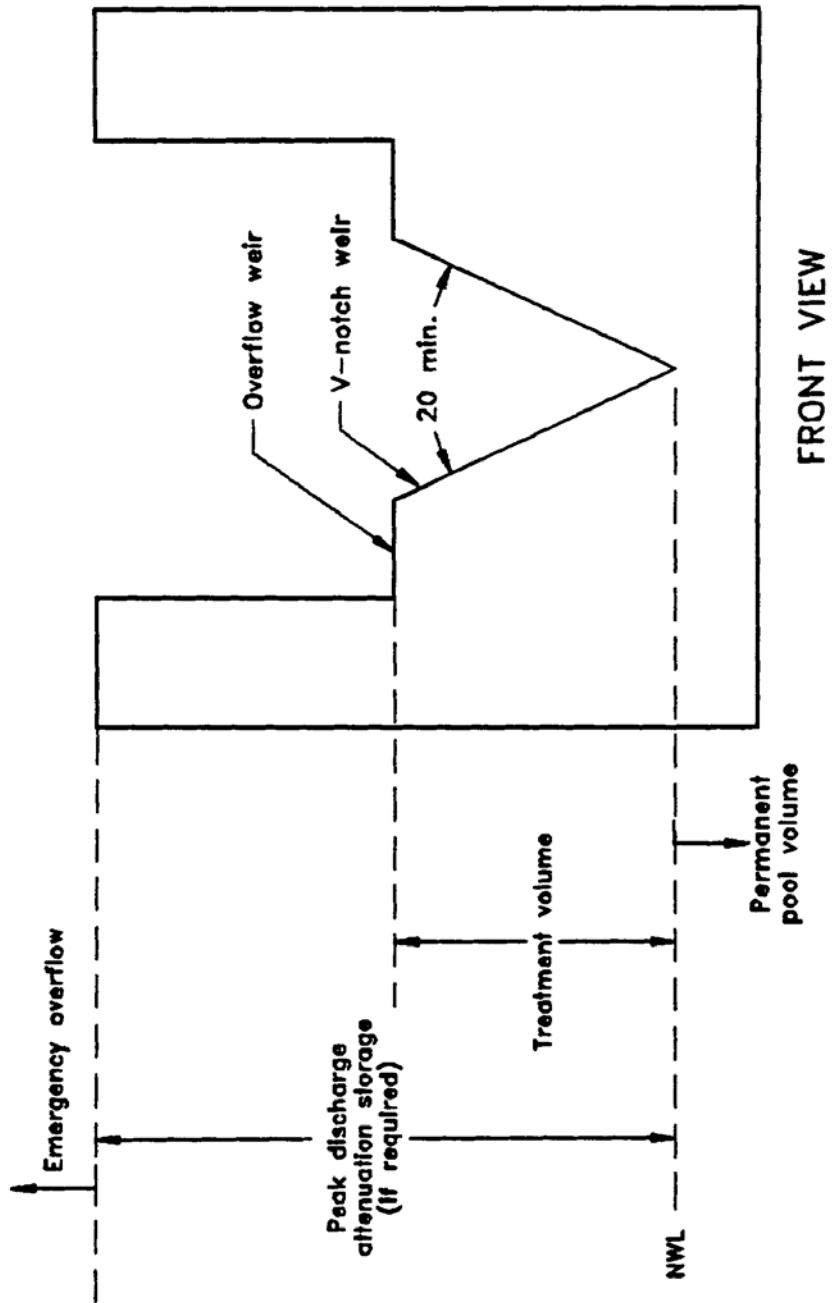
Typical wet detention outfall structure with "V"-notch weir (N.T.S.)
